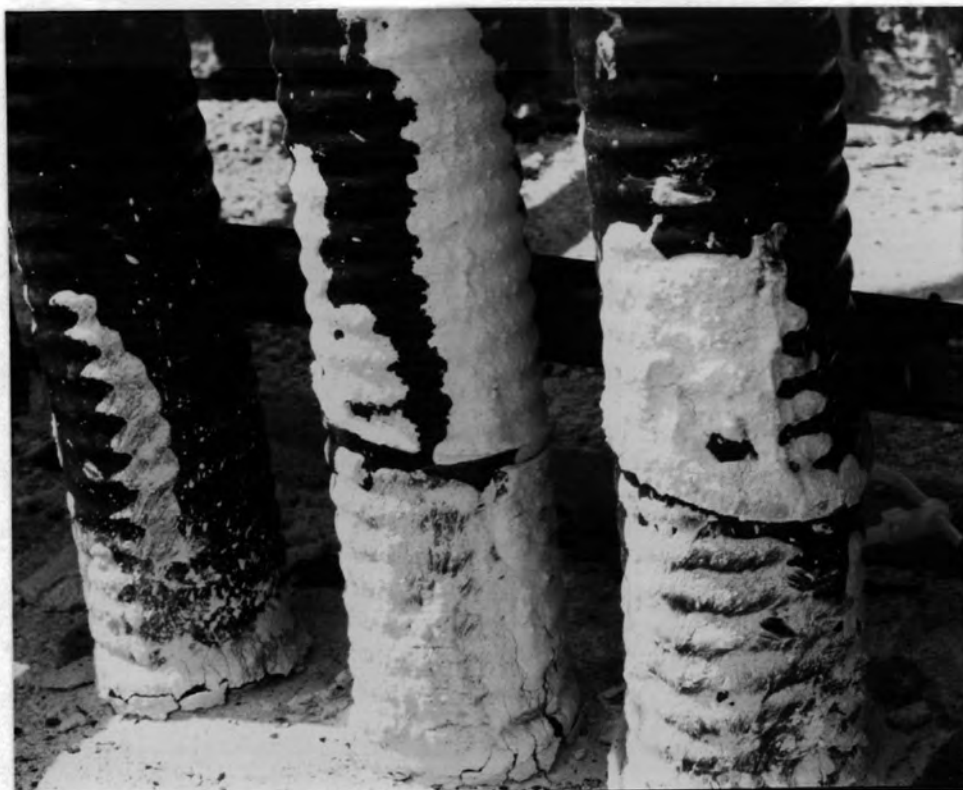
UNEXPOSED SURFACE OF SEAL
